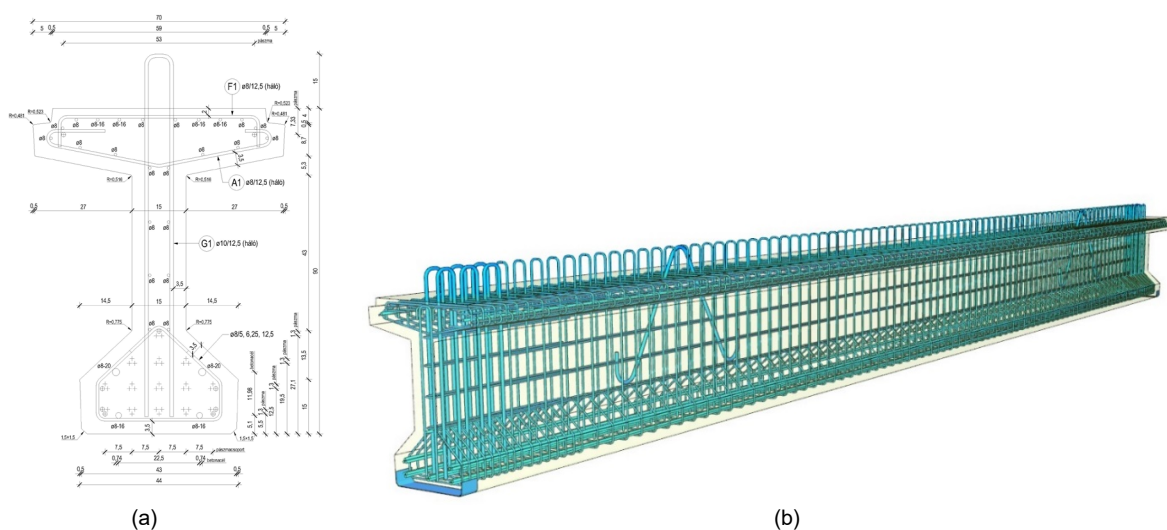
(a) Cross-section and (b) 3D view of the ZBI-90 type bridge girders.
